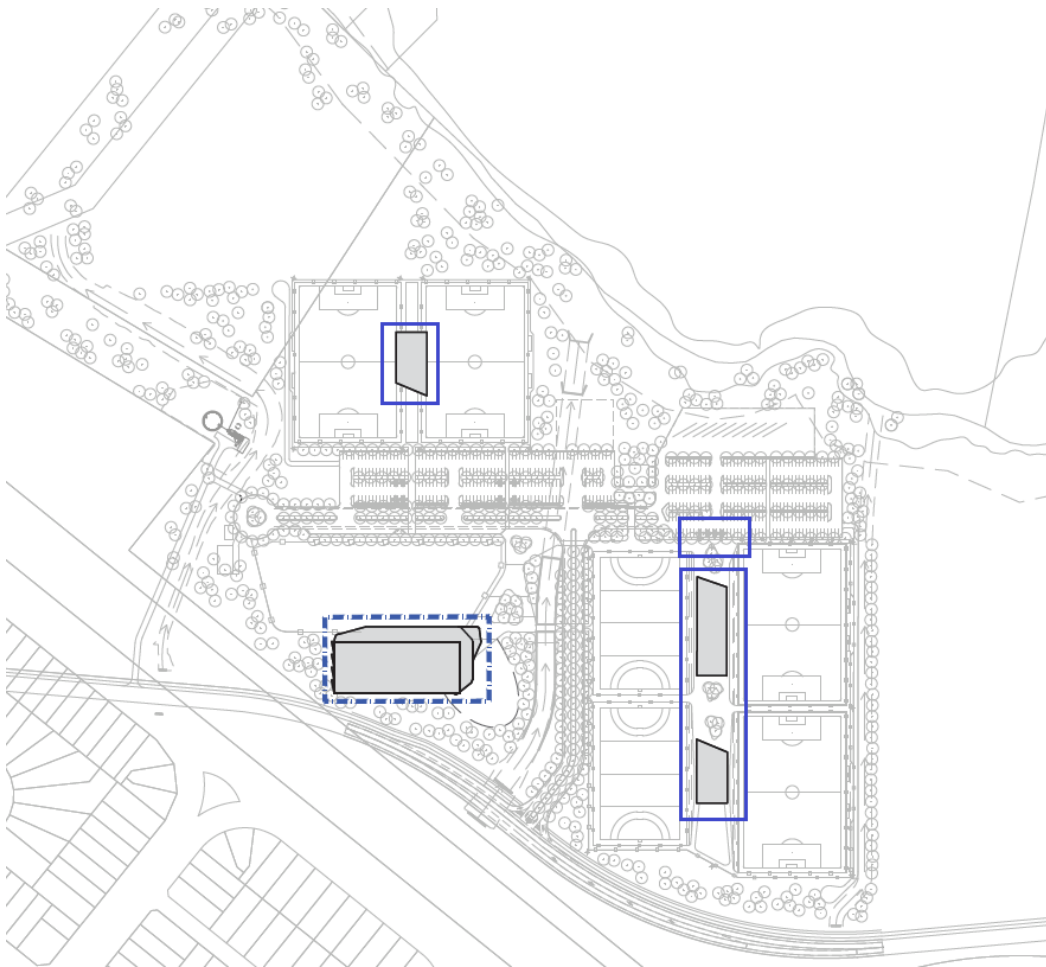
Concept Plan, Queanbeyan-Palerang Regional Council (Oxygen Drawing Set)
